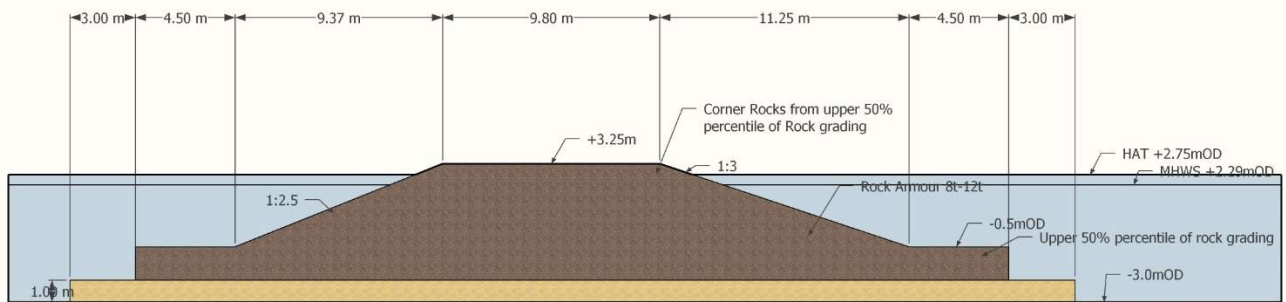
Sketch of town beach breakwaters according to Layout 3
